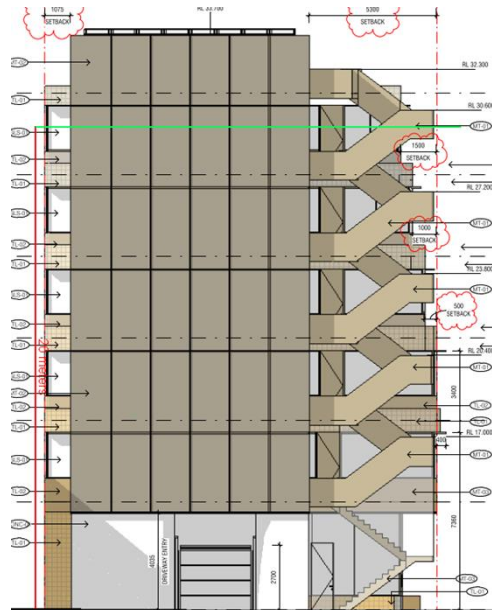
West elevation showing Draft UDF preferred 20m maximum boundary wall height in green
